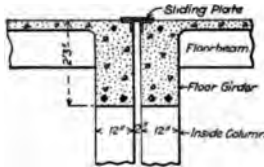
Expansion Joint in Floors, United Shoe Machinery Co.'s Factory.
